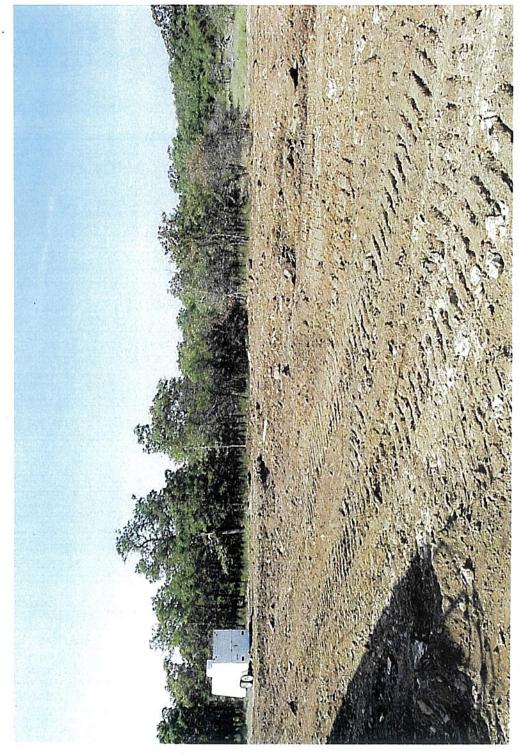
taken southwest. Old pit locations were present here before being filled with dirt.
